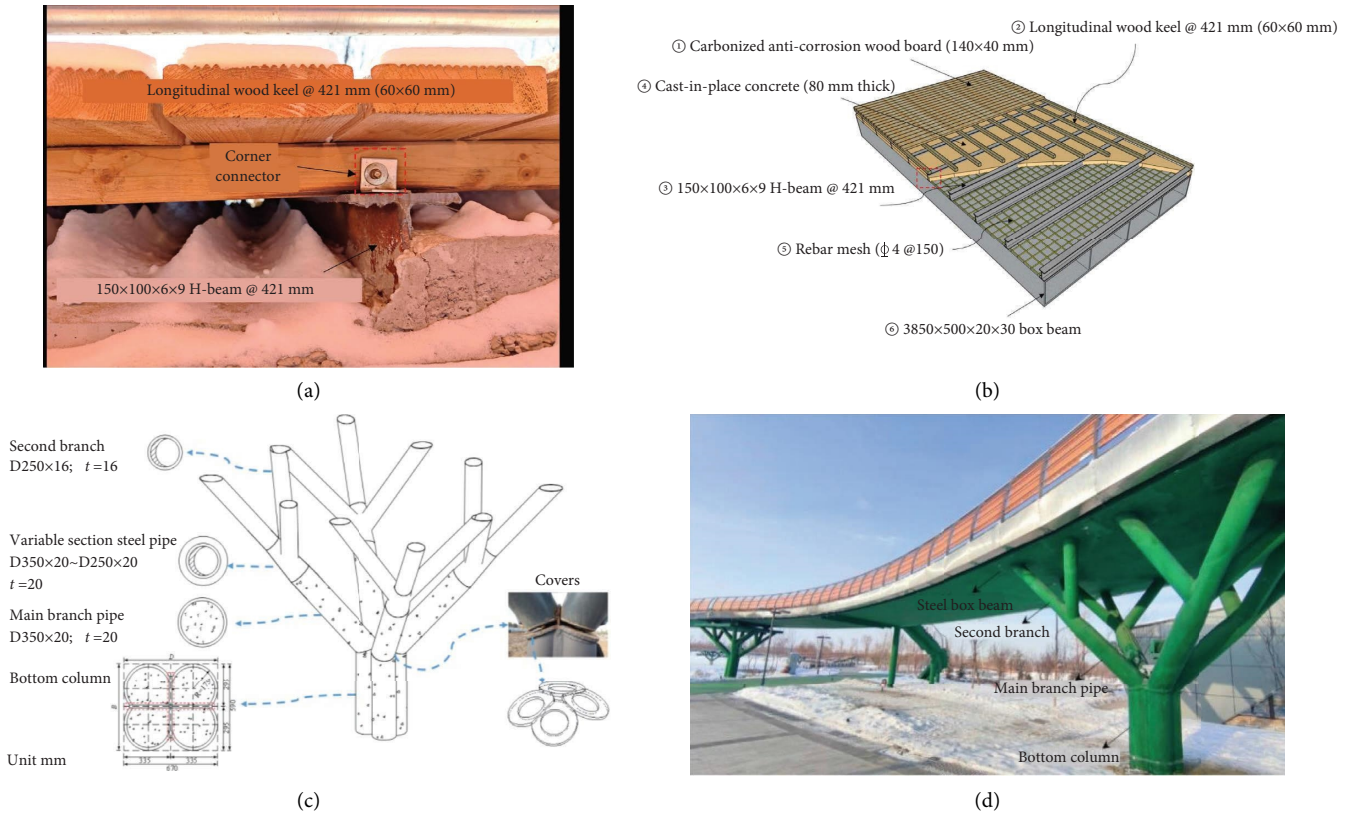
(a) Bridge superstructure details, (b) bridge span structure, (c) tree pier and column structure, and (d) test pedestrian bridge.
